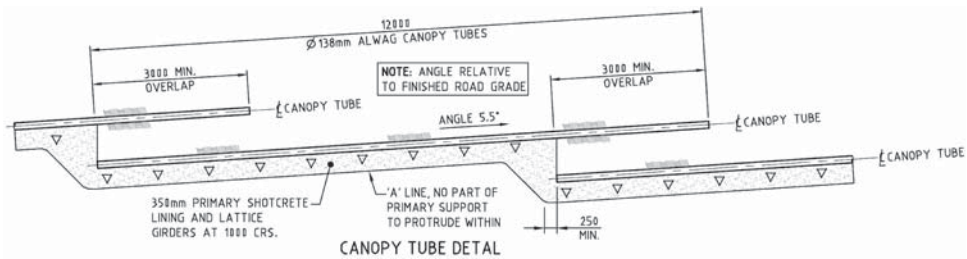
Details of the canopy tube and shotcrete in a section through the tunnel crown.
